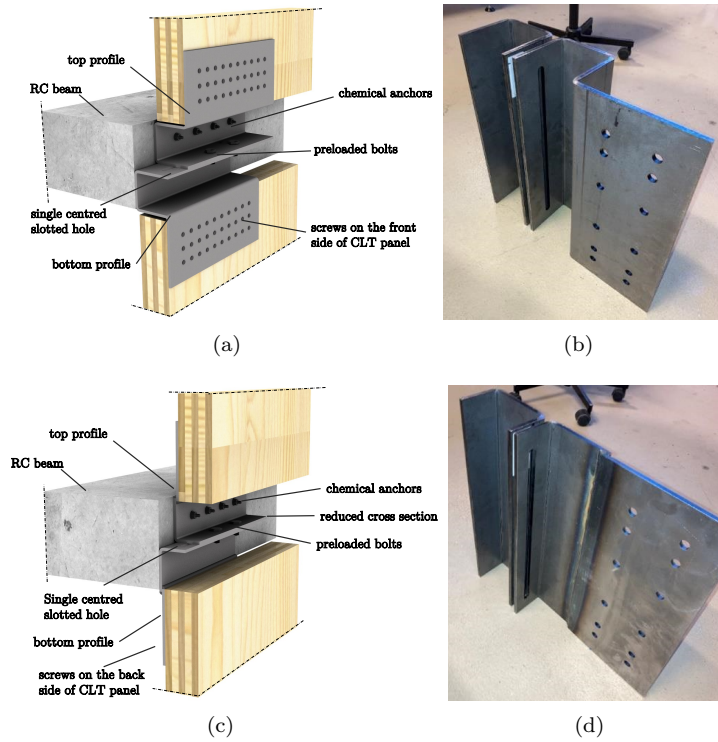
(a) STD-1H prototype; (b) STD-1H specimen; (c) ALT prototype; (d) ALT specimen.
